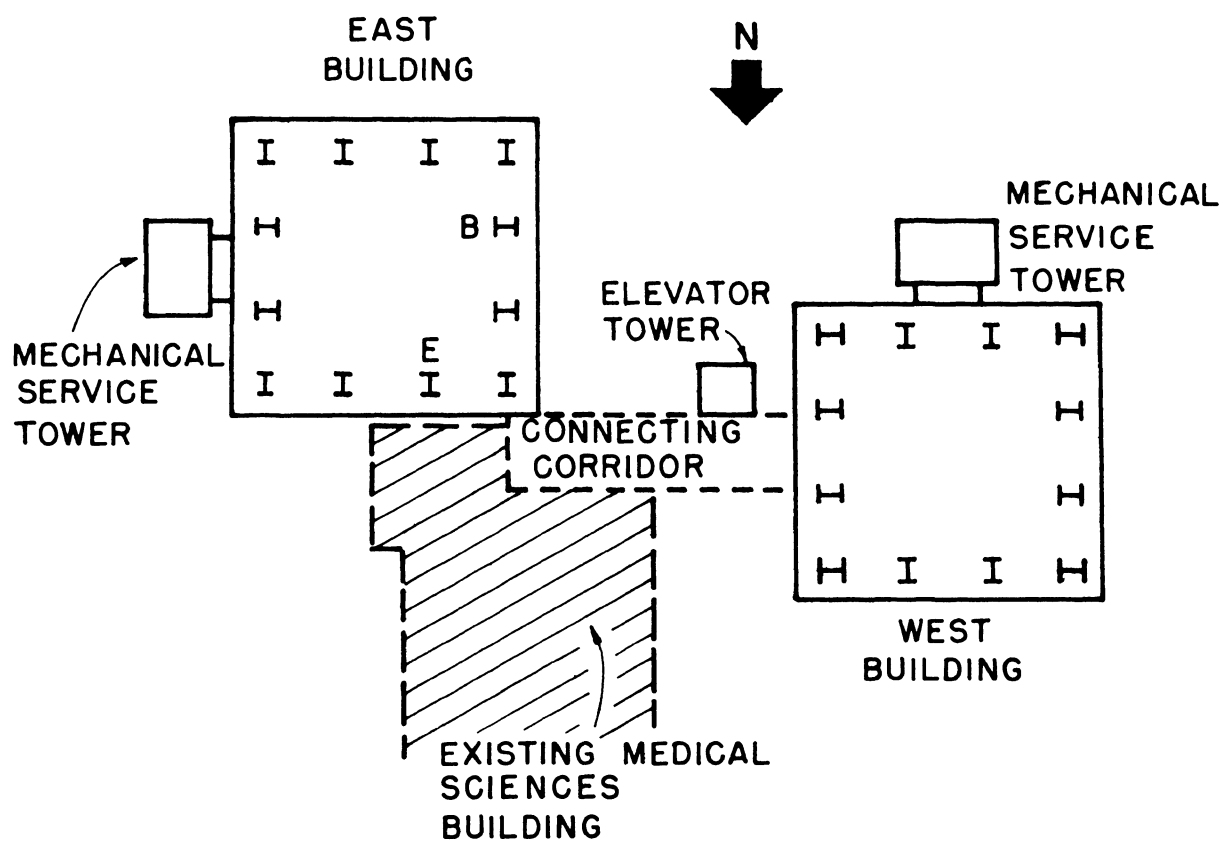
GENERAL PLAN OF BUILDINGS
